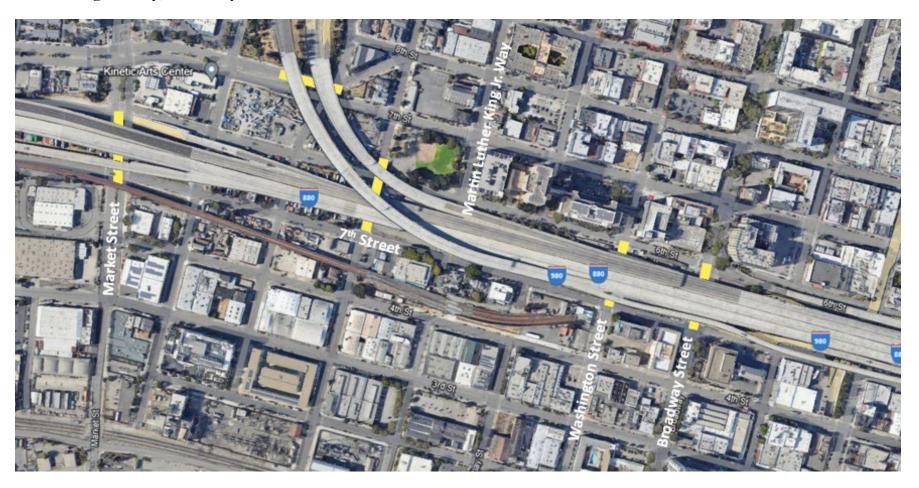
Subproject 12 – Construction for the 1-880 and 1-980 undercrossings at Washington Street, Markey Street, Martin Luther King Jr. Way, Broadway, and  $7^{th}$  Street Corridors
